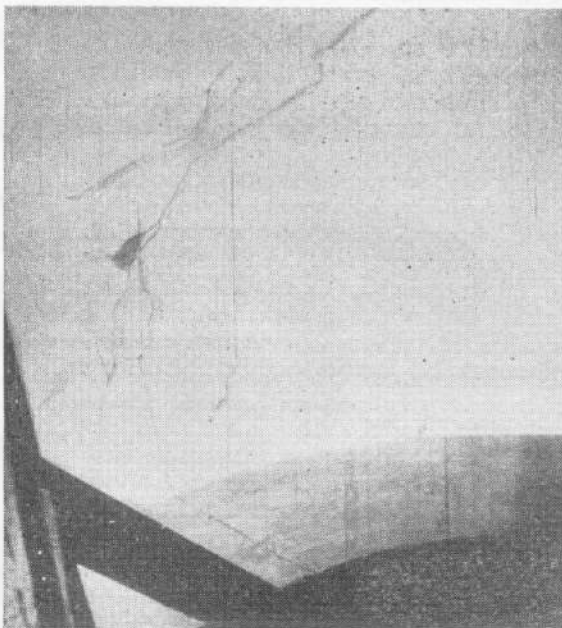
Development of cracks in masonry arch in Shri A. C. Hiriyaniah's residence.
